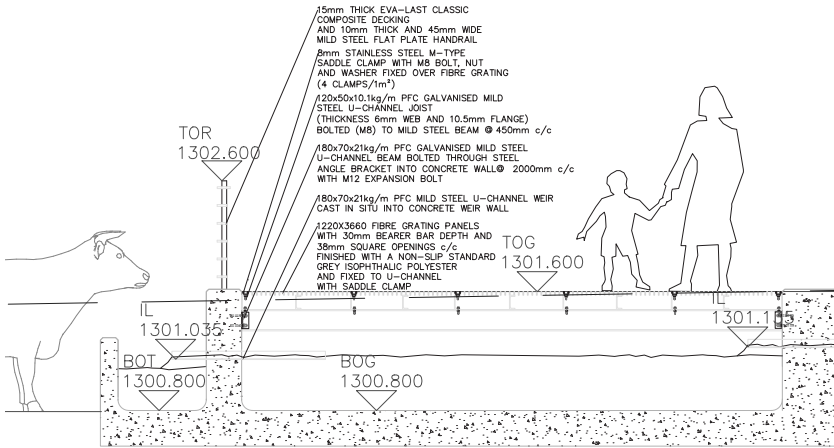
Detail 3.1-Section detail showing fibre grating over water channel and cattle trough - not to scale (Author: 2013)
